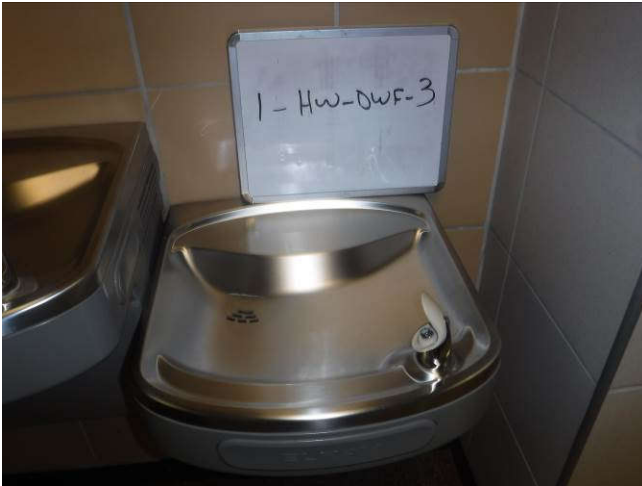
Drinking water fountain located on 1st floor Across from restrooms & room 139 (right fixture)
